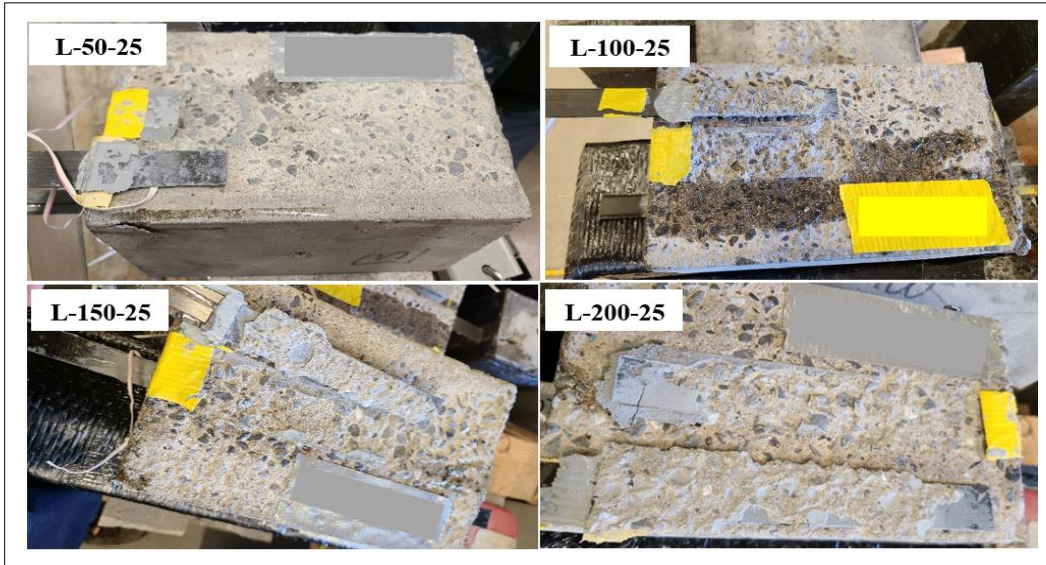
Failure modes of specimens bonded with CFRP laminate (Series 1)
